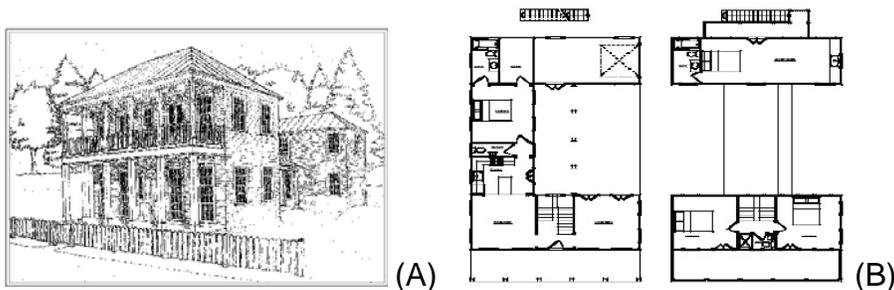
Katrina Courtyard Cottage (Sorlien, 2006). (A) Street view of exterior, (B) Floor plans highlighting the wings bracketing the courtyard.
